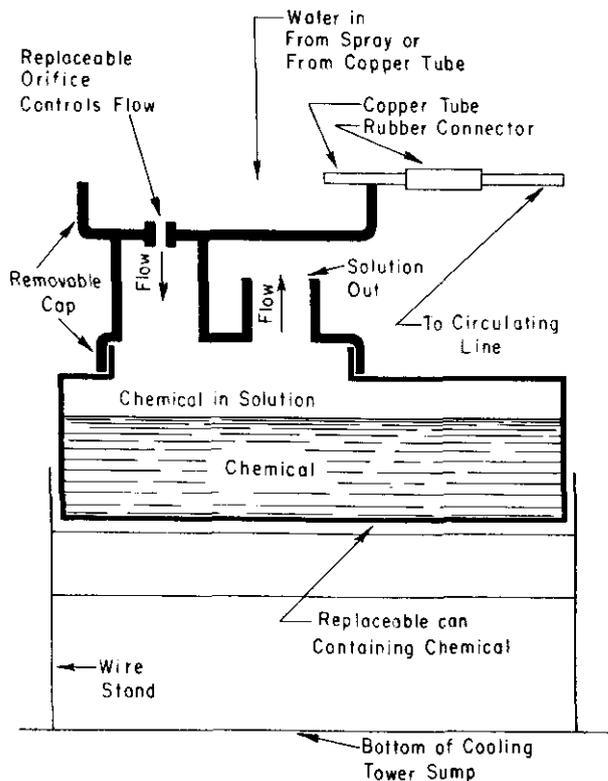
Cross Section of a Simple Manufactured Feeder
